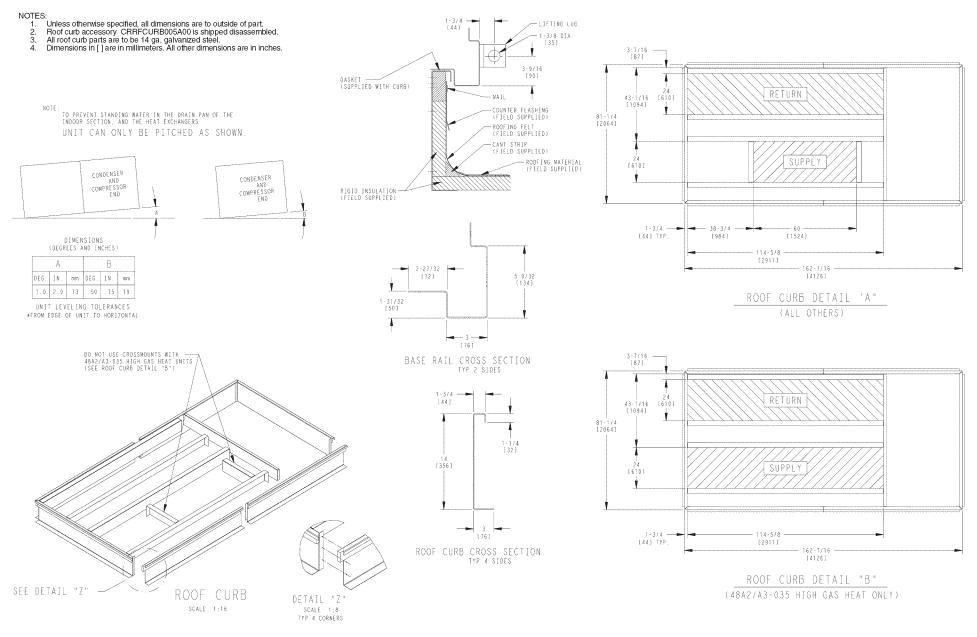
Roof Curb — 48A2,A3020-035 Units
